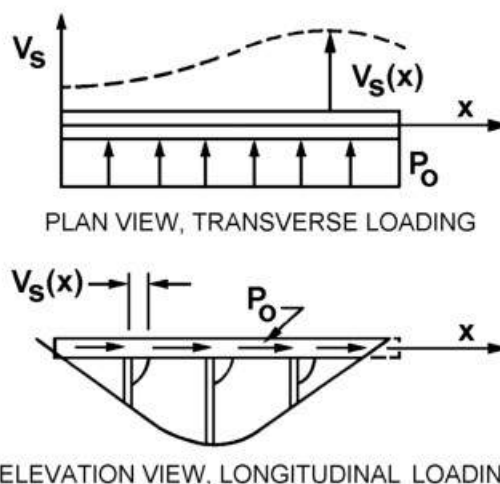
1—Bridge Deck Subjected to Assumed Transverse and Longitudinal Loading
